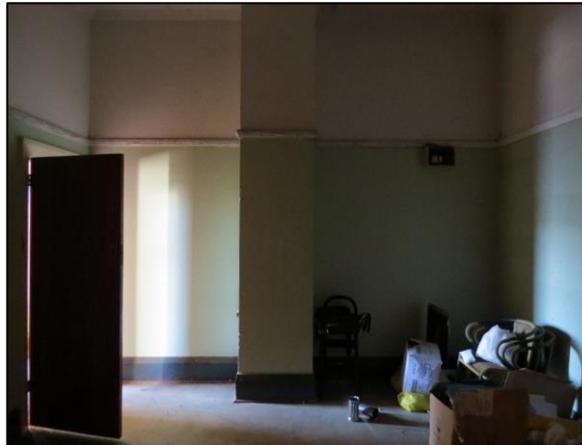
Room 37, facing north. Note boarded column in centre of image is marked as a lift in September 1942 plans (Figure 5-24)
